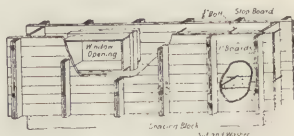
Arrangement of form when window is to be inserted—Sectional form to be raised as wall is built up and used over and over.
